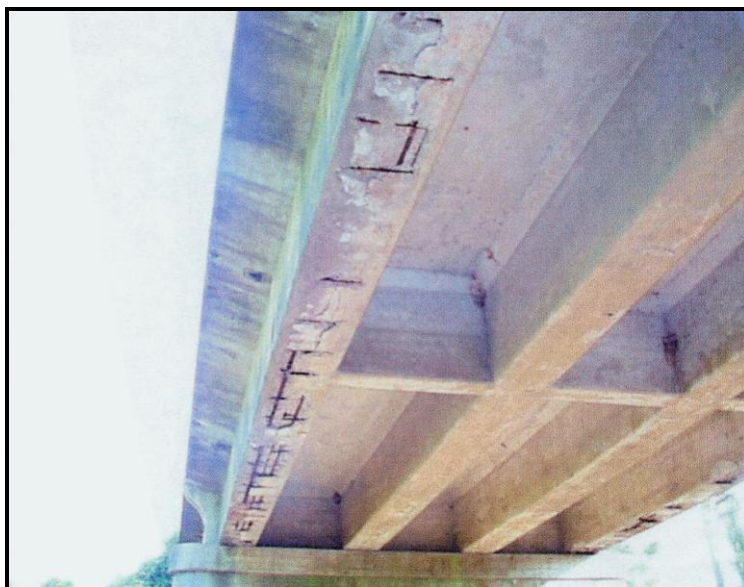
Beech Fork Concrete Beam Bridge (Bridge 50-152/00-040.39) in Wayne County, Constructed in 1932, illustrating a concrete T-beam bridge (photograph courtesy of West Virginia Division of Highways)
